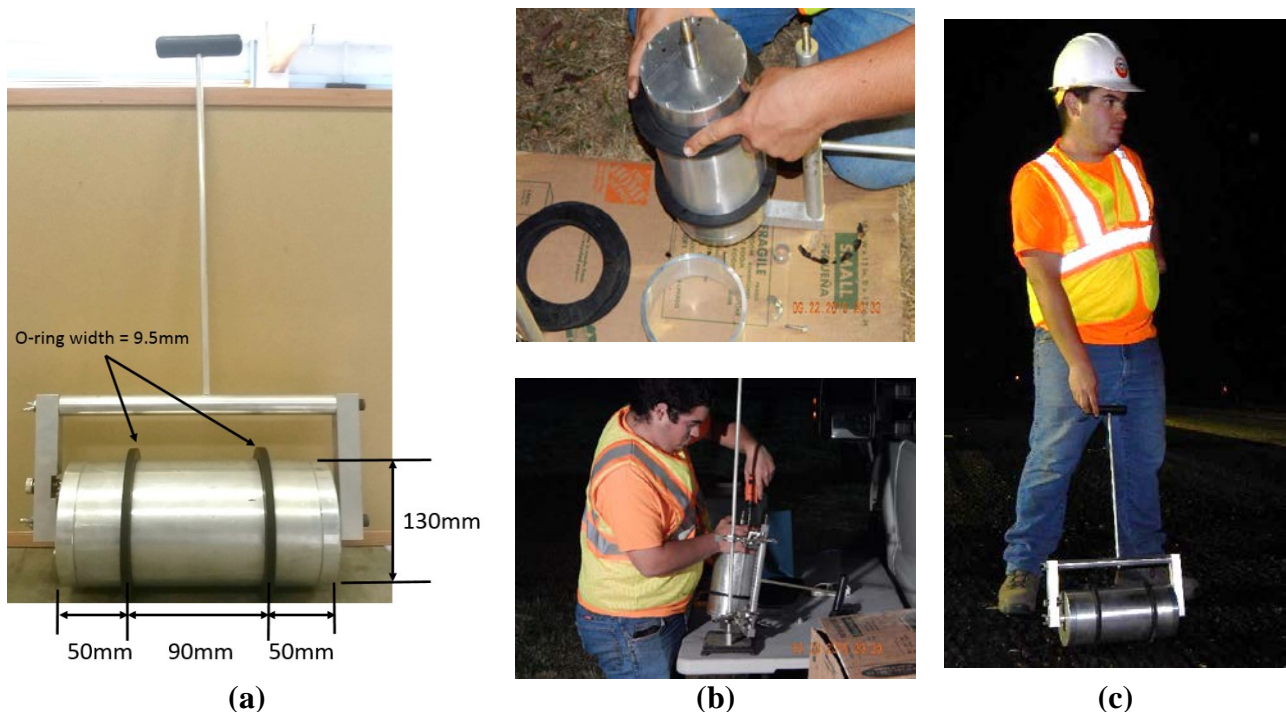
Tack coat wheel tracking device (a) schematic (b) removing O-rings in field (c) use of wheel device during a field test
